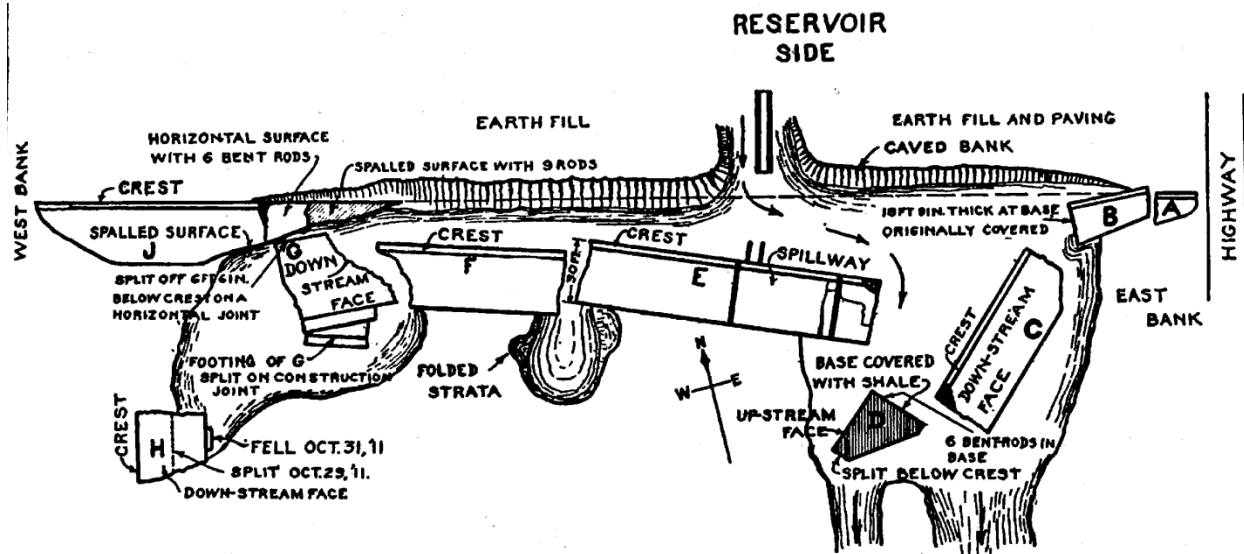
Plan of Austin Dam after failure.<sup>13</sup>
